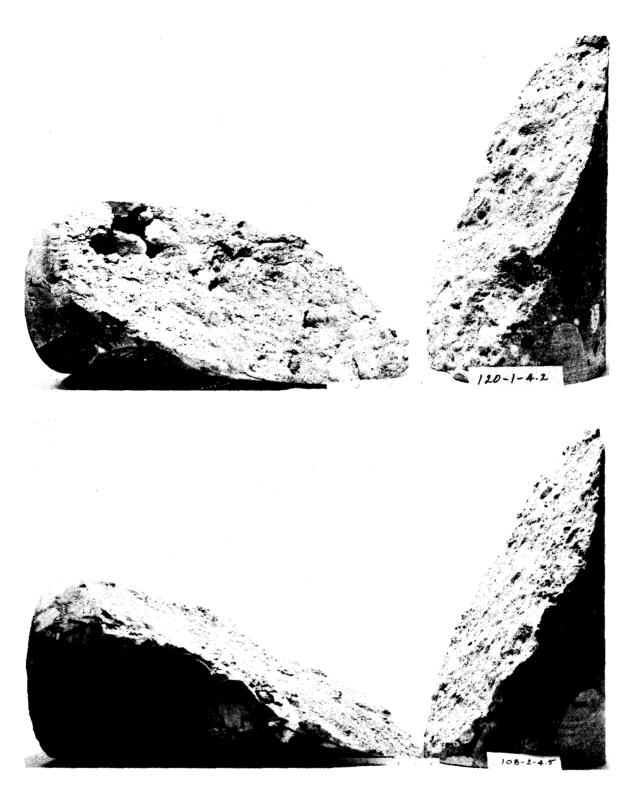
Photograph of jointed concrete showing failure surface Top - at "0" lateral load (note hole in horizontal piece and smooth plane indicating poor bond) Bottom at 200 lb/in² lateral load (note smooth plane) C-8322-49 C-8322-54
